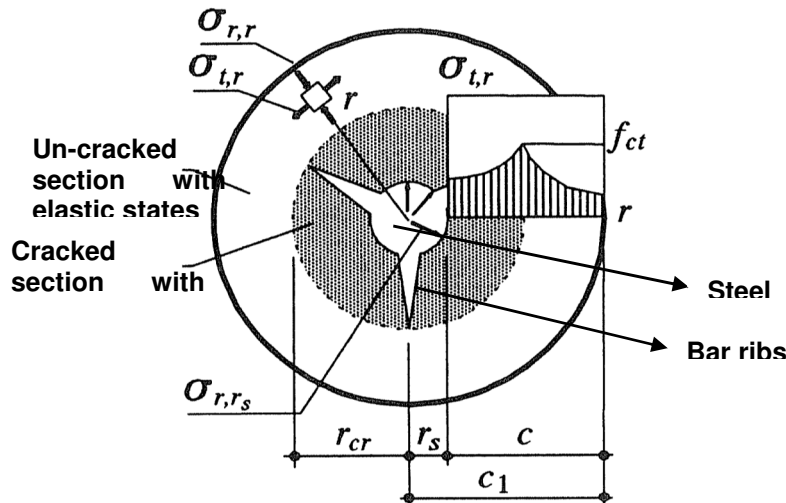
Partly cracked section in pull out based on thick walled cylinder theory
